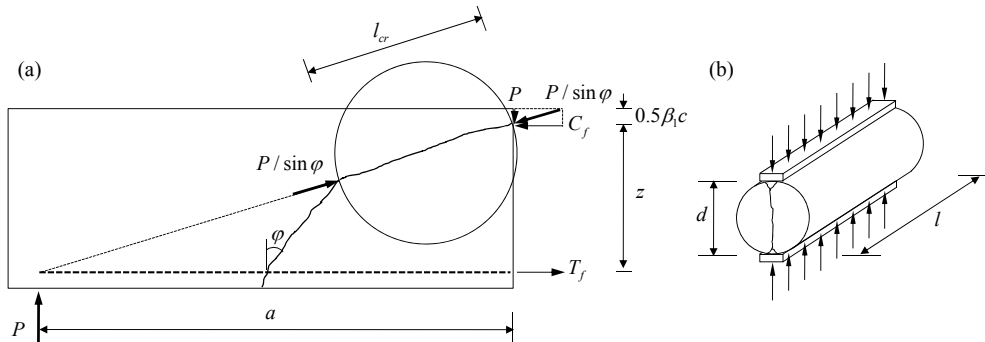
Failure due to splitting of concrete proposed by Zararis et al. (2001): (a) Distribution of normal stresses along line of second branch of critical crack; (b) Splitting failure of concrete
